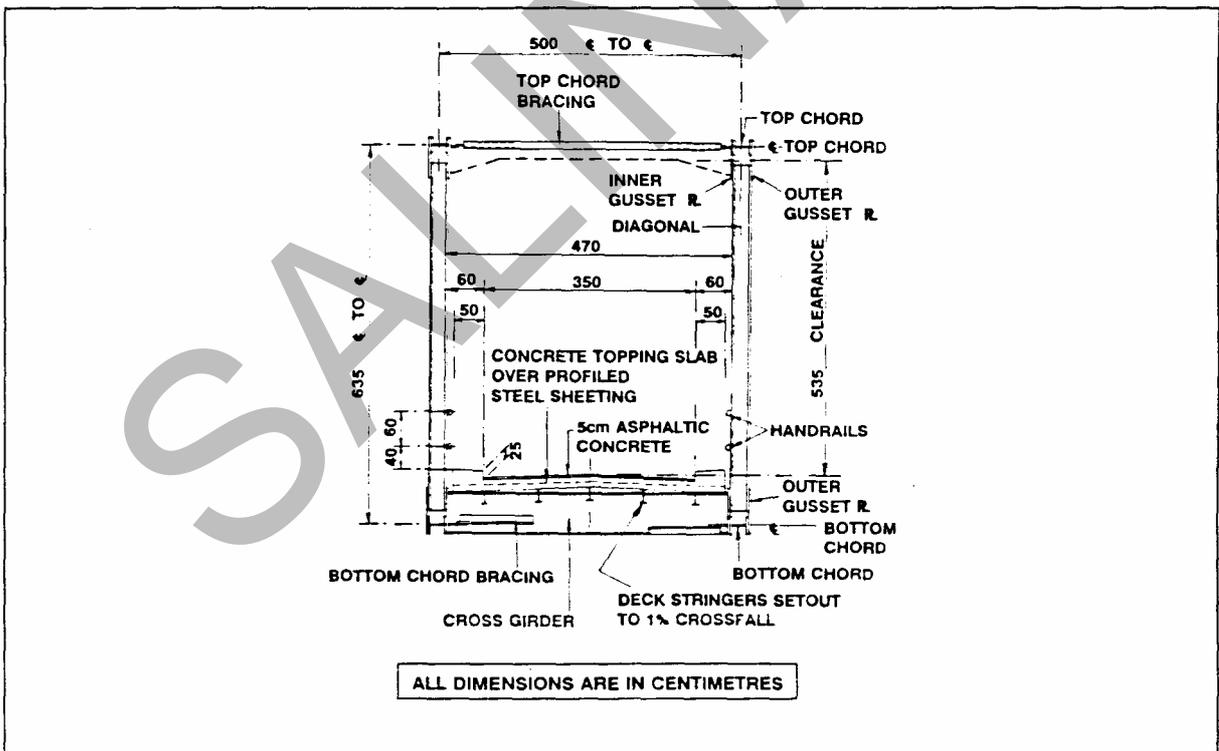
Semi Permanent Truss with Concrete Deck
